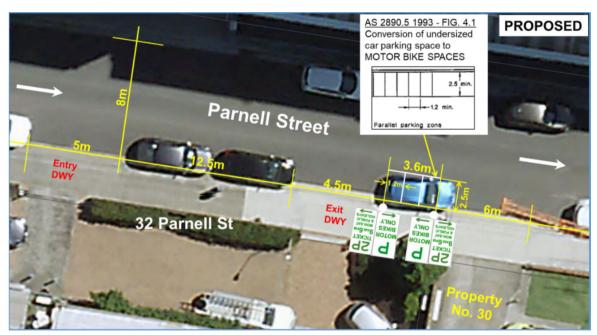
Proposed parking fronting 32 Parnell Street, Strathfield.
